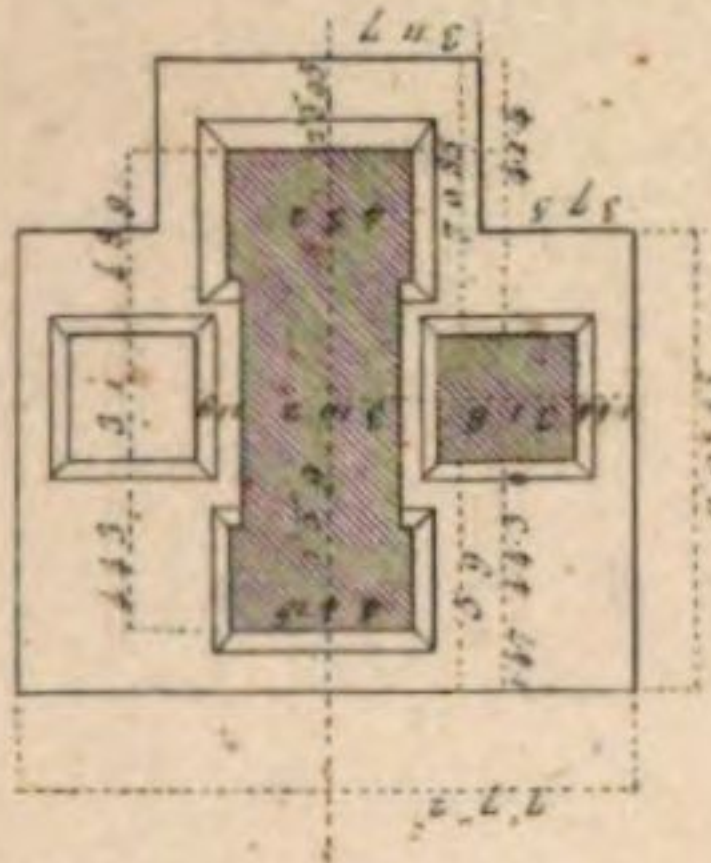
Plan of the upper range: the portions still existing are in shade.
